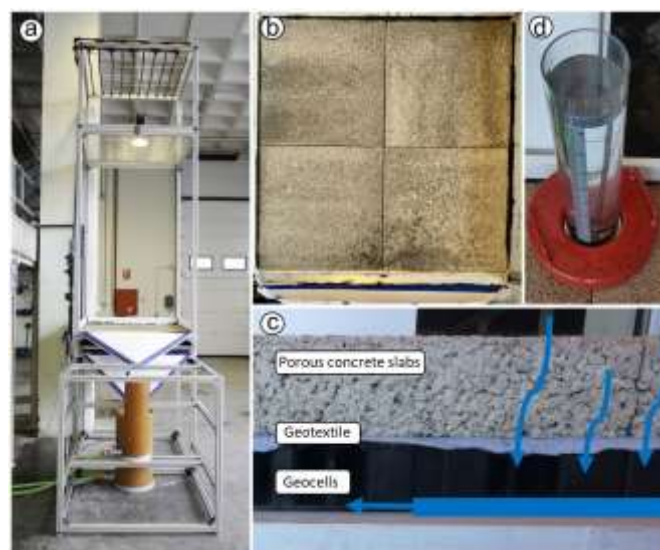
a) Rainfall simulator, b) pavement system top view and c) cross-section, and d) LCS permeameter.
